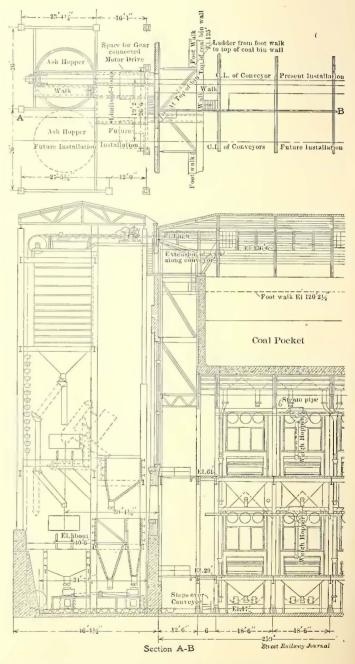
SECTION AND PLAN OF END OF BOILER-ROOM, SHOWING CONVEYOR SYSTEM
